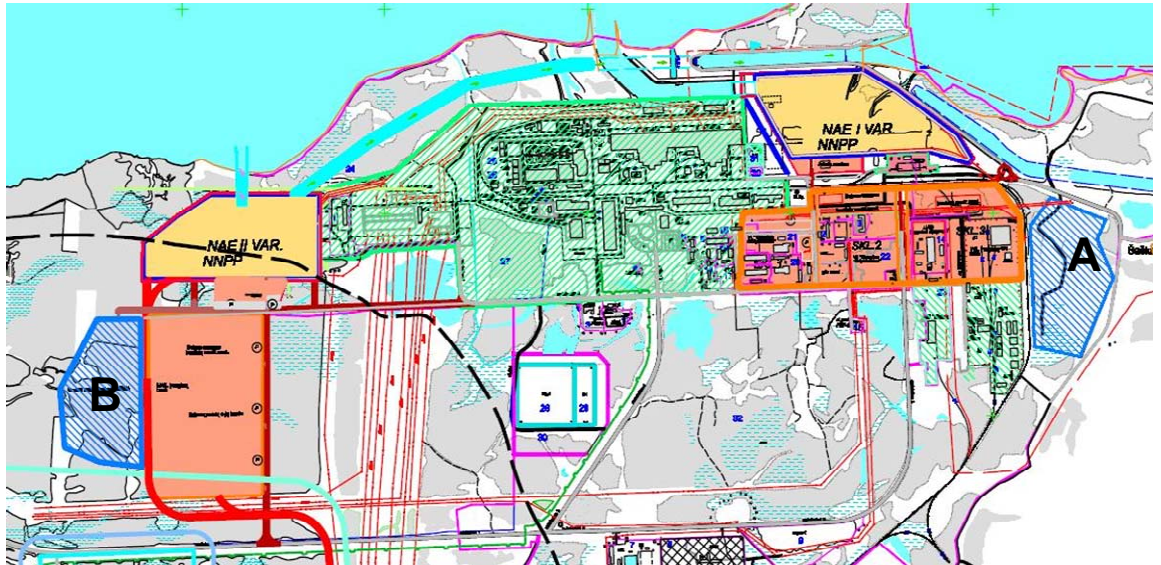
Preliminary locations of the soil dumping areas during construction of the NNPP: area A for Site No. 1 and area B for Site No. 2.
